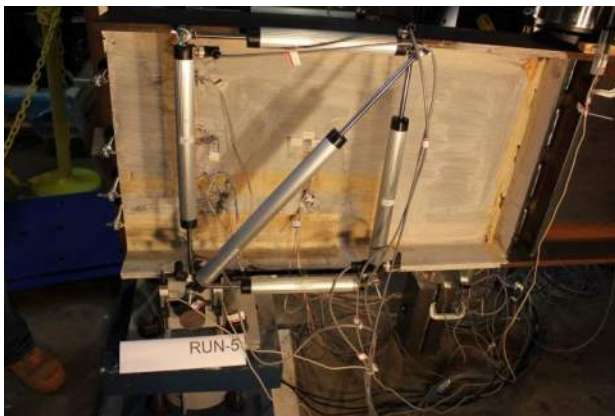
Damaged Girder Right: 16 kip
